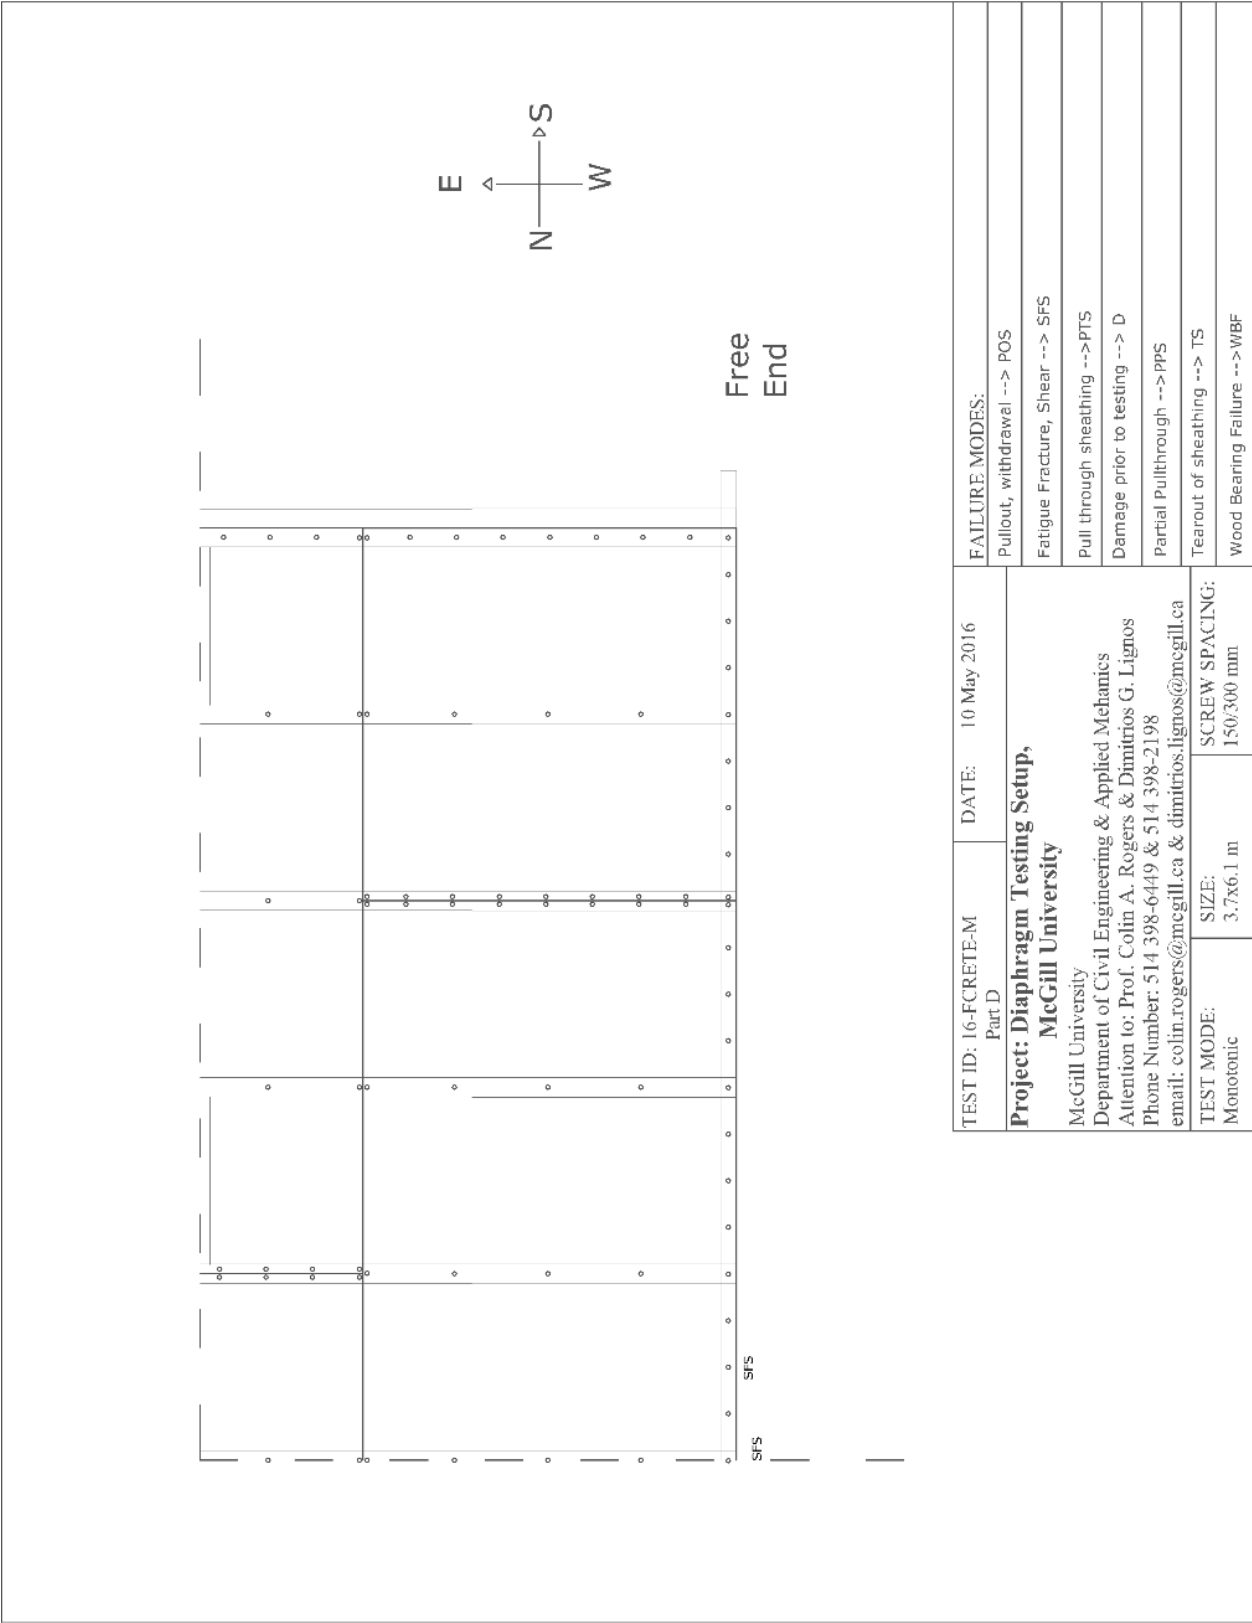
Sheathing Fastener Failure Modes Part D Specimen 16-FCRETE-M
